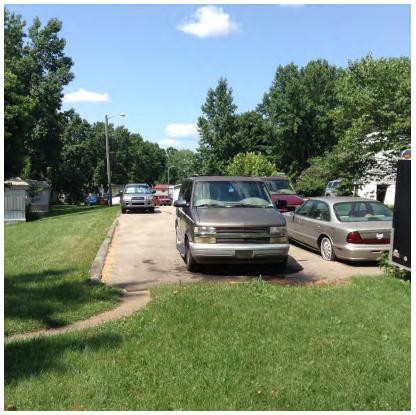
View facing north from Southcrest mobile home park. View of where future sidewalk would connect to proposed subdivision. Existing road stub not proposed to be extended.
